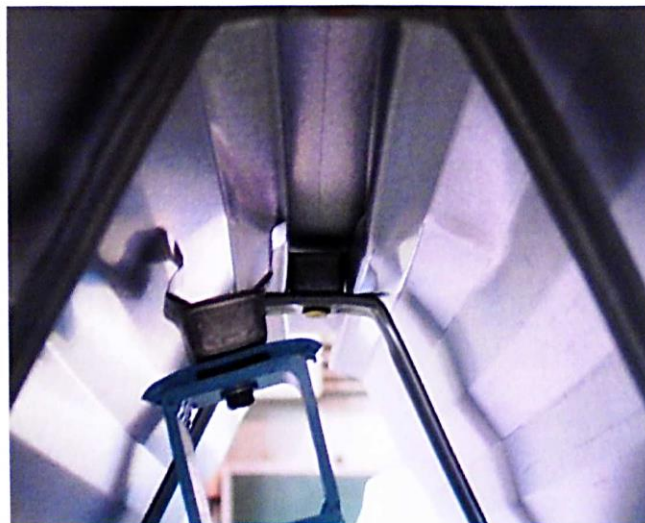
Example of strength test for the connection of folded roofing (SSR2007)
